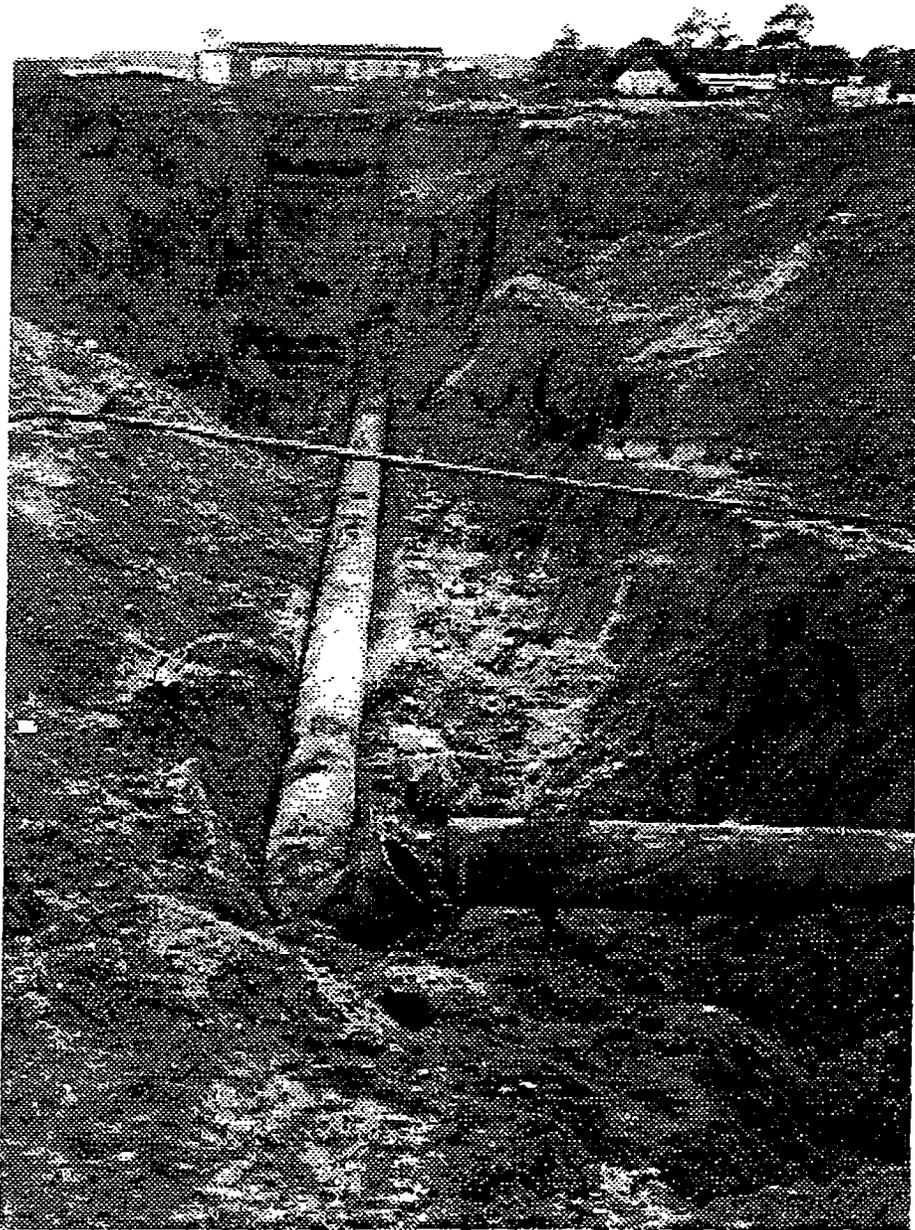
Removal of 10" fuel supply line heading west towards Day tank.
